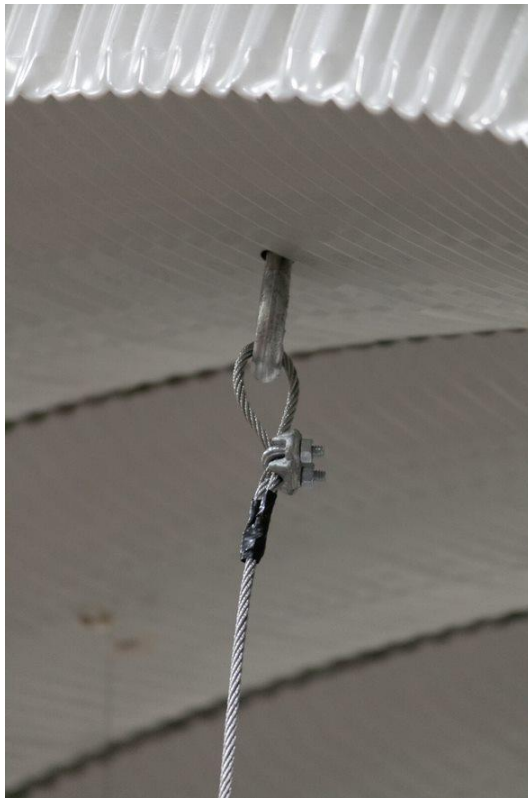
K-Span Connections Between Eyebolts and Steel Cable
